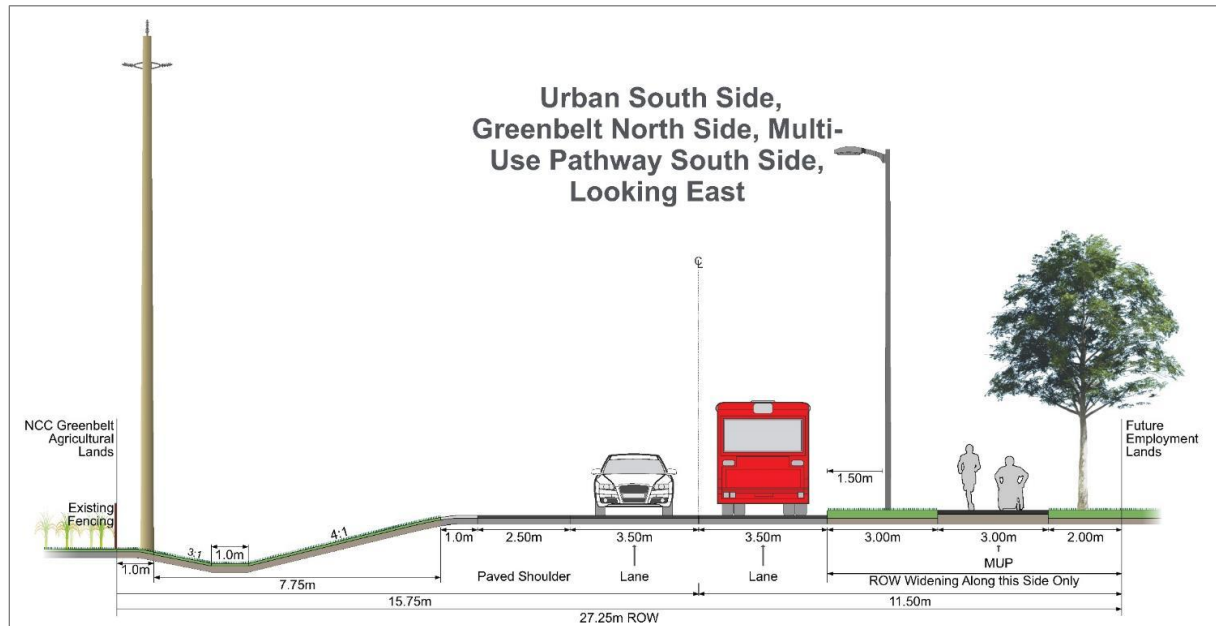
Recommended Plan, Leitrim Road – River Road to Limebank Road
